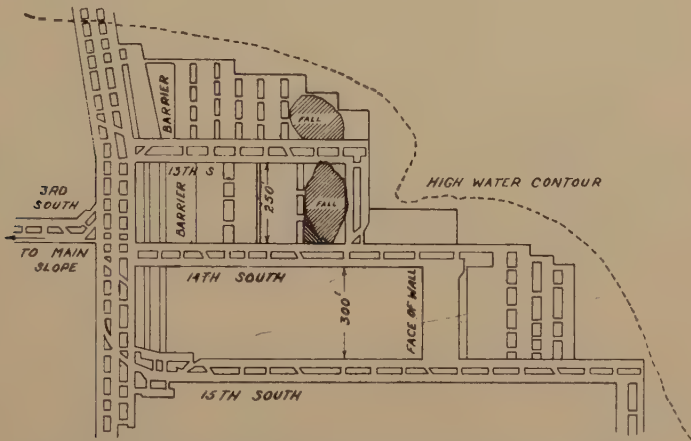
WALL DEVELOPMENT, SOUTH SIDE OF PRACO MINE.
